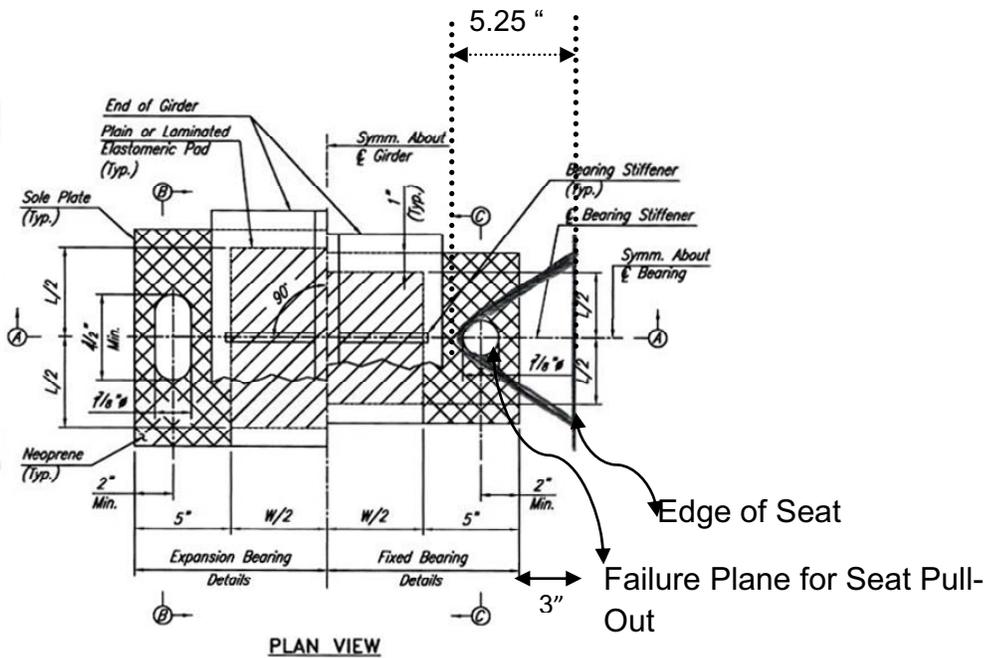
Anchor Bolt Shear Failure Plane
